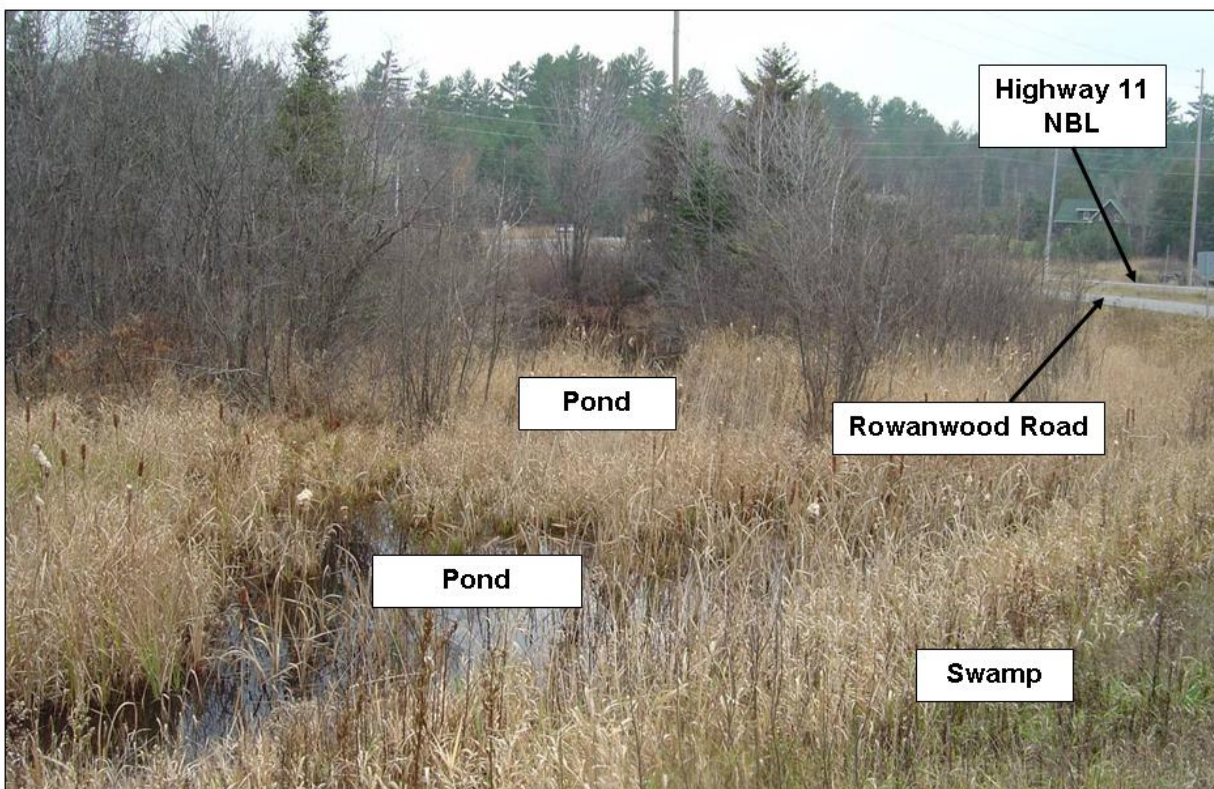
VIEW: Looking south from east shoulder of Rowanwood Road at about 100 m north of Rowanwood Retirement Home. Swamp area in foreground. (Nov. 2007)
